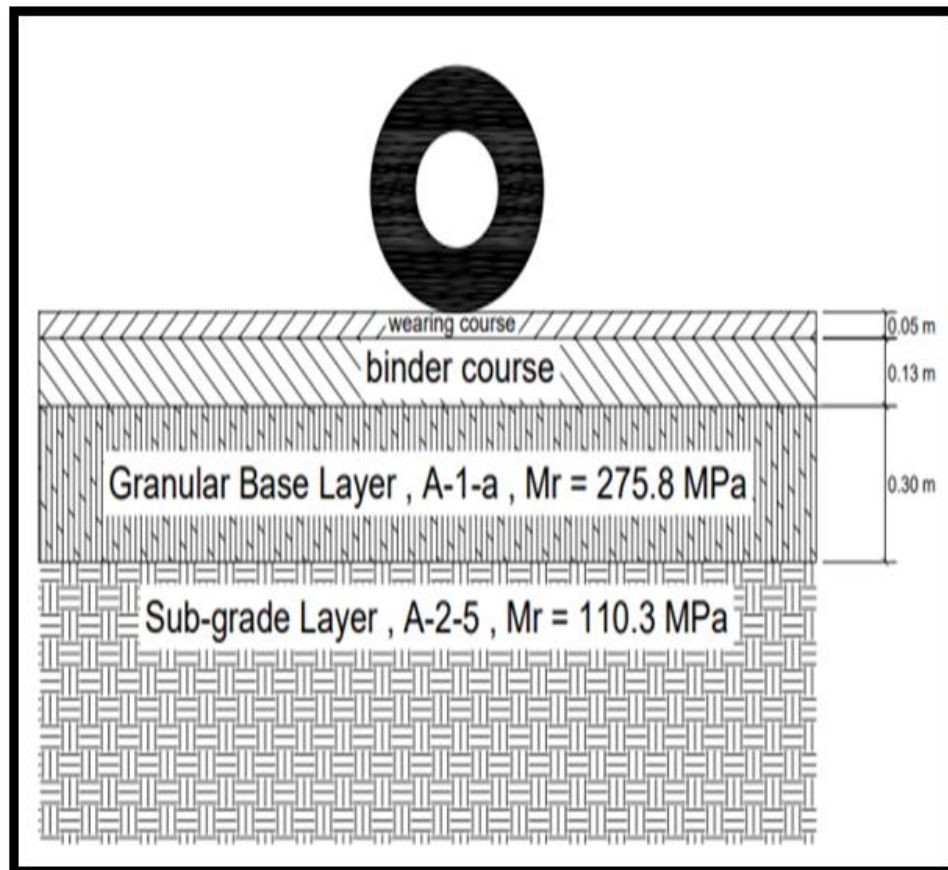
Typical Flexible Pavement Section Used in the MEPDG Runs
